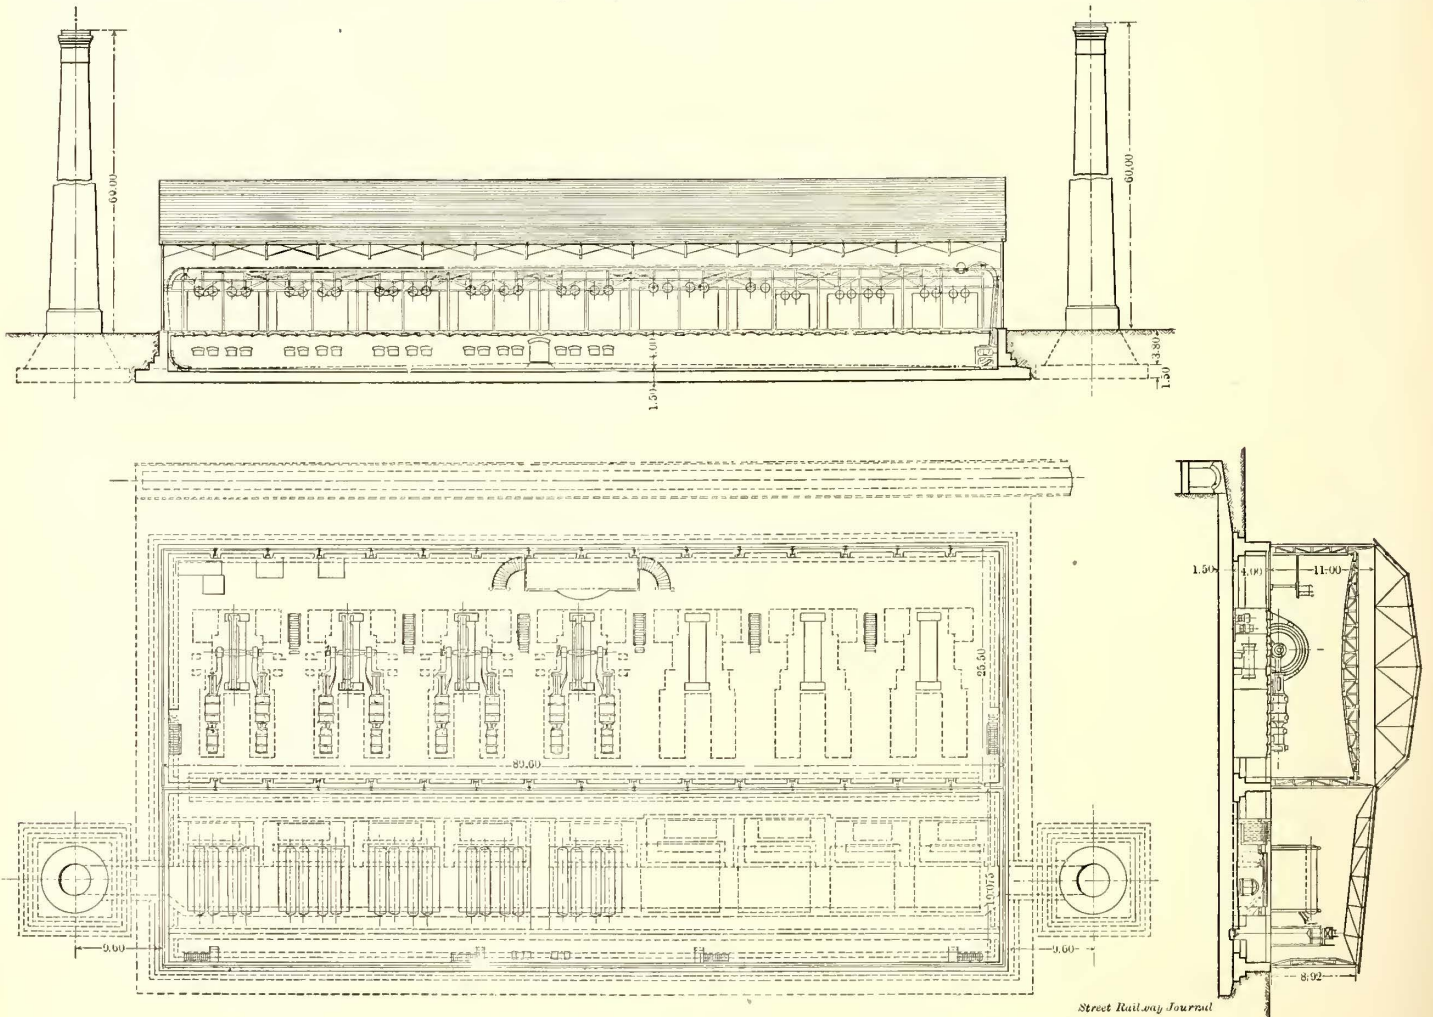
PLAN AND SECTION OF NEW POWER STATION, BRUSSELS
